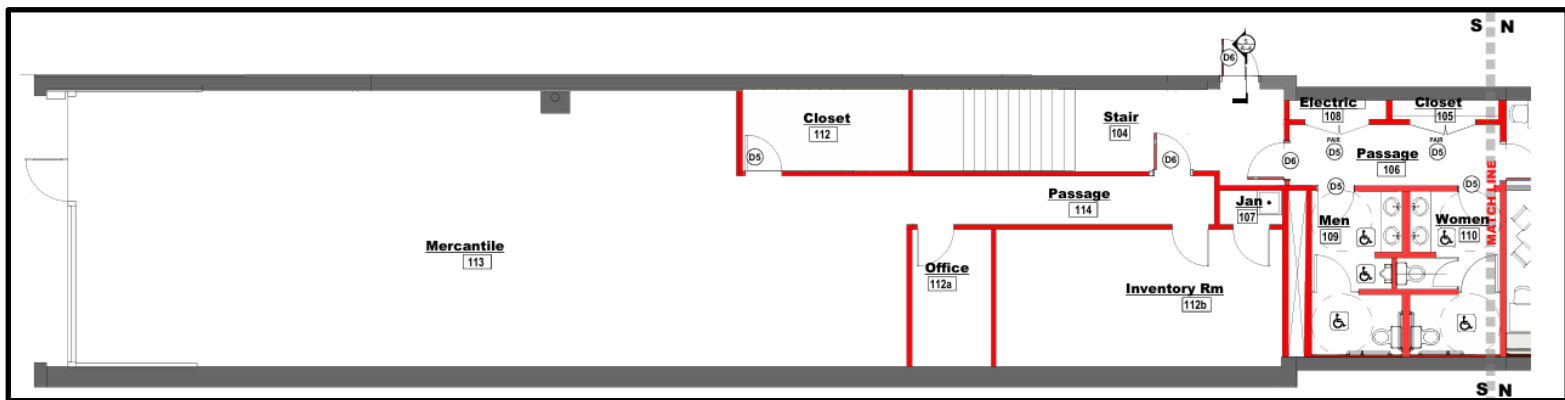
FIRST FLOOR – NORTH W/ CLOSET (112) AND OFFICE (112A)
